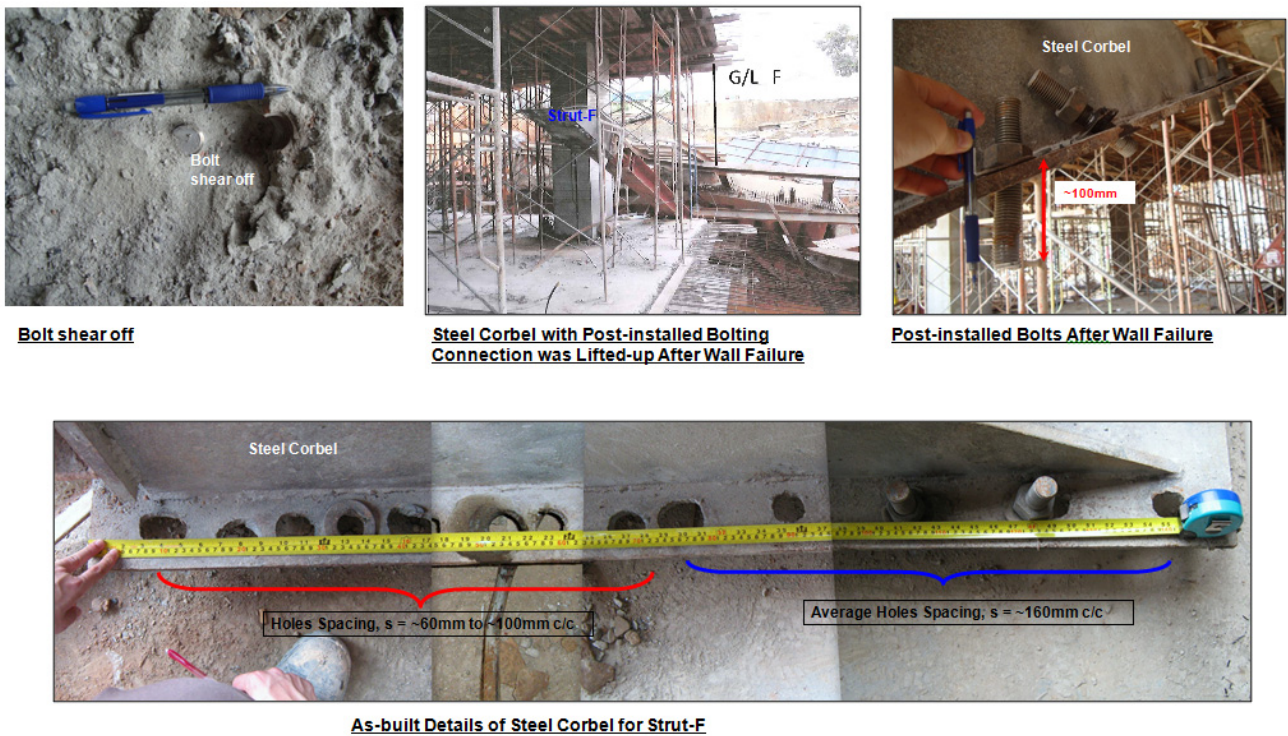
Steel corbel with post-installed bolting connection after wall failure
